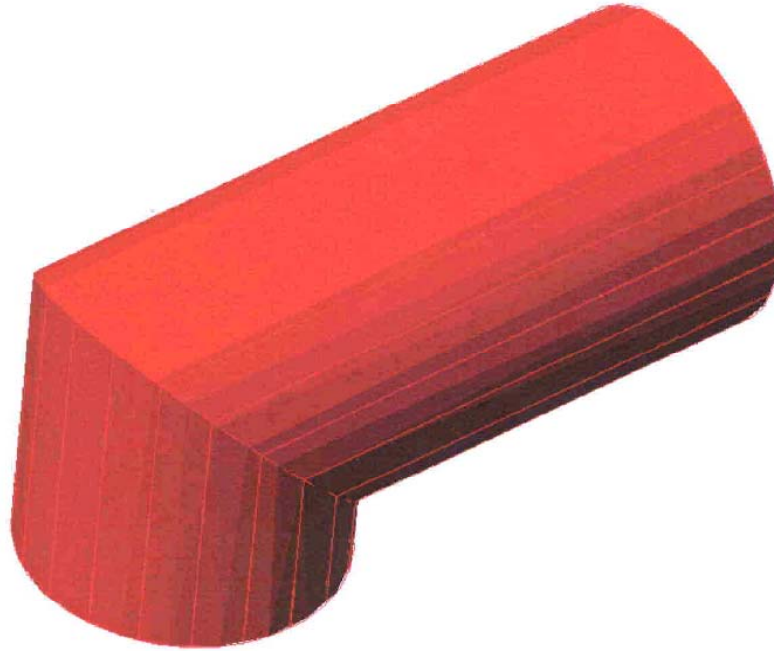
Isometric shape of the Beam-Joint Steel Jacket
